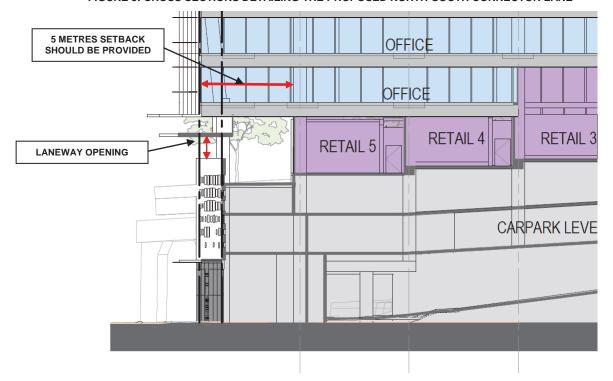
CROSS SECTIONS DETAILING THE PROPOSED NORTH-SOUTH CONNECTOR LANE
